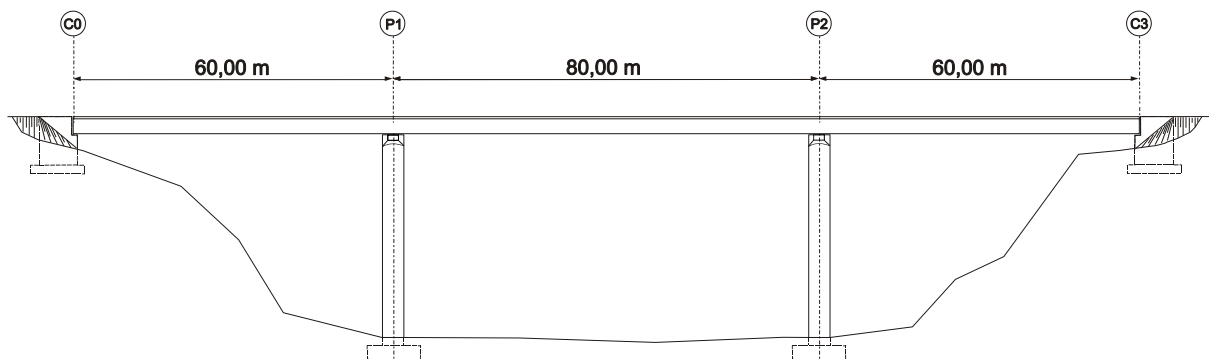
Bridge elevation with piers $H = 40$ m
